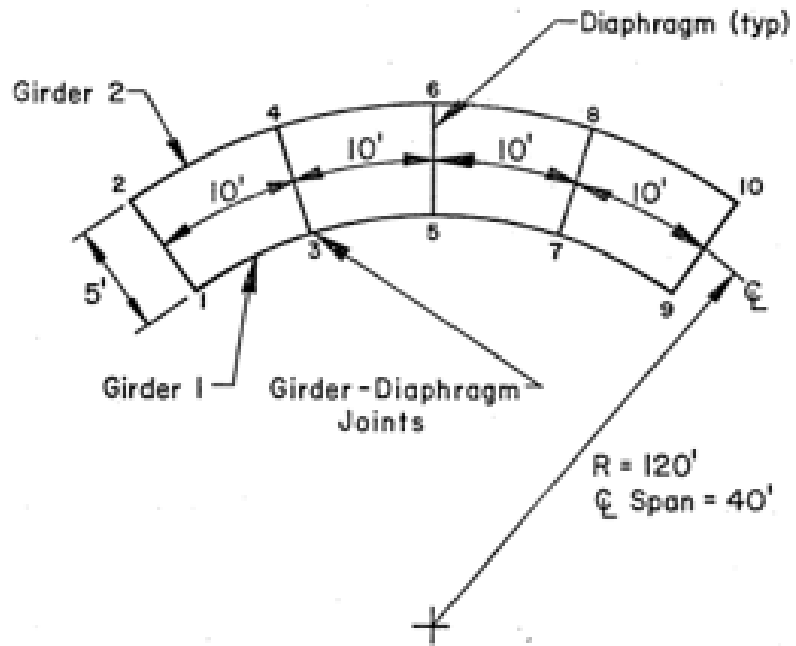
Schematic plan view of test girders (Daniels and Herbein 1980)
